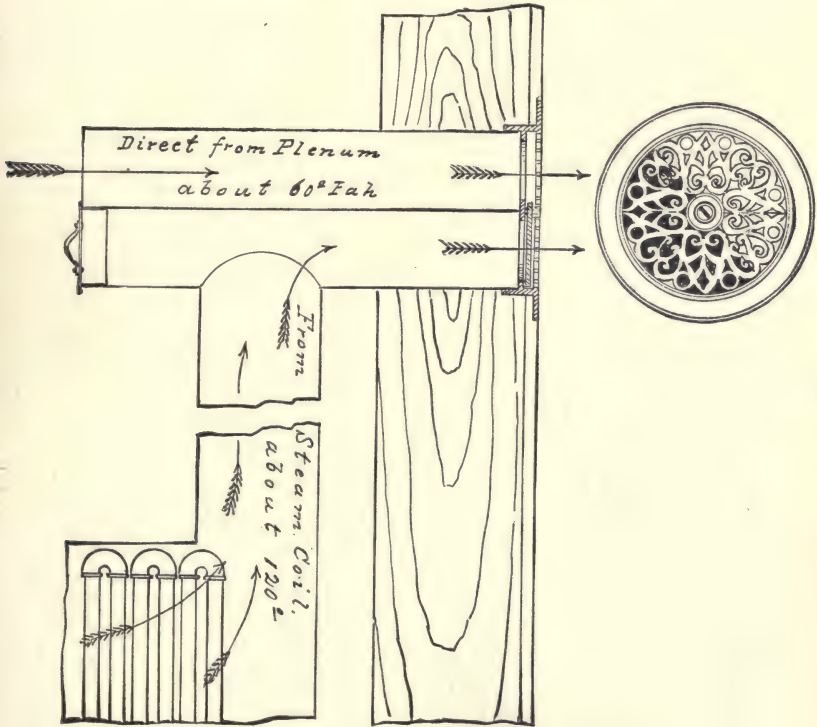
PLAN AND SECTION OF MIXING REGISTER.
